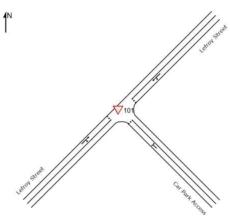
Geometric layout – Lefroy Street / Car Park Access intersection
